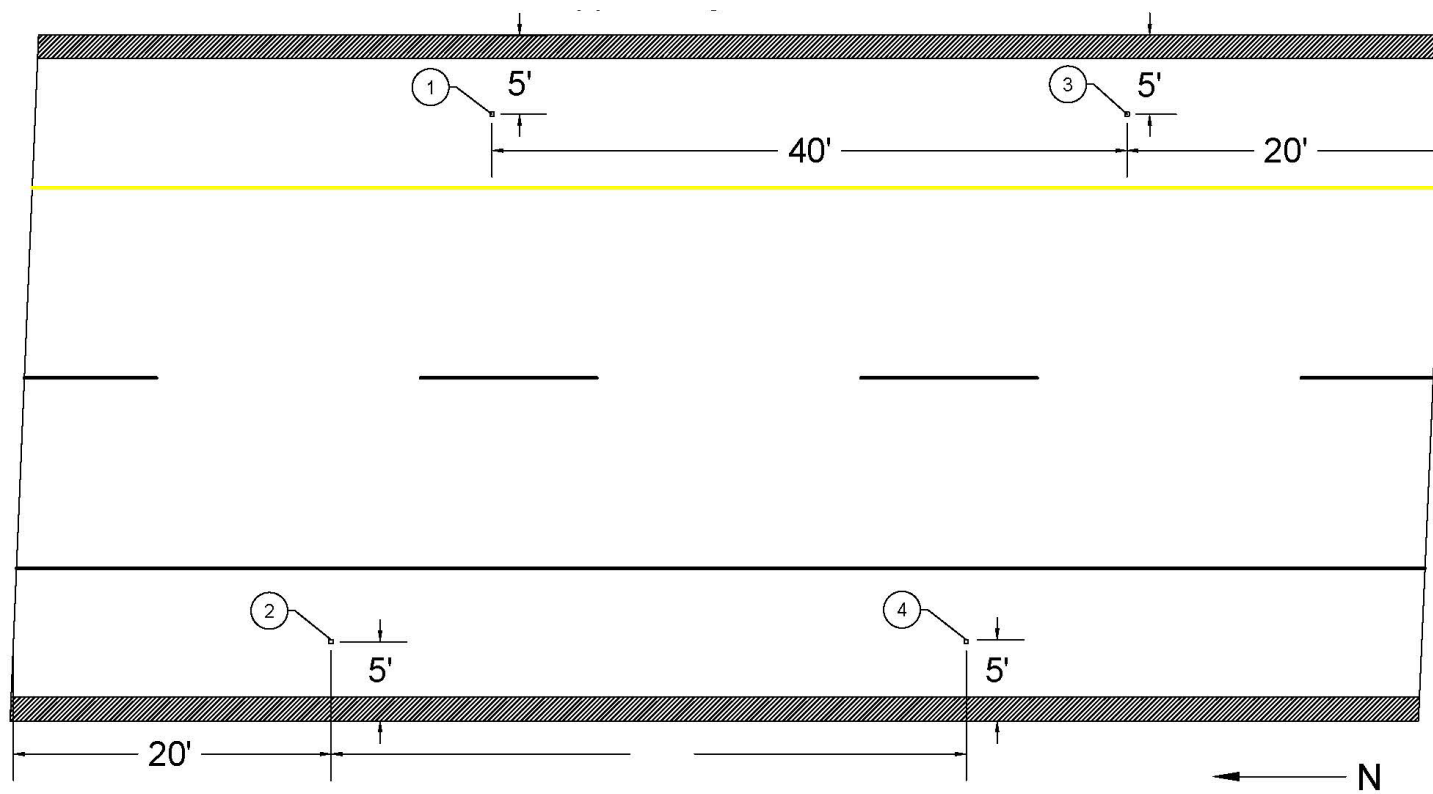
Sampling locations for concrete collected for cylindrical and beam specimens for Wolverine Way SB deck.
